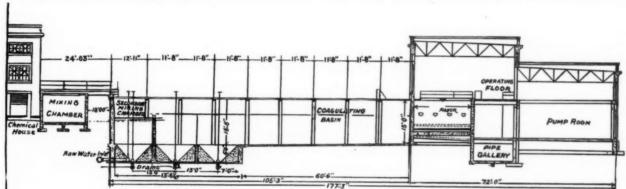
SECTION THROUGH FILTER PLANT AND PUMP ROOM.
